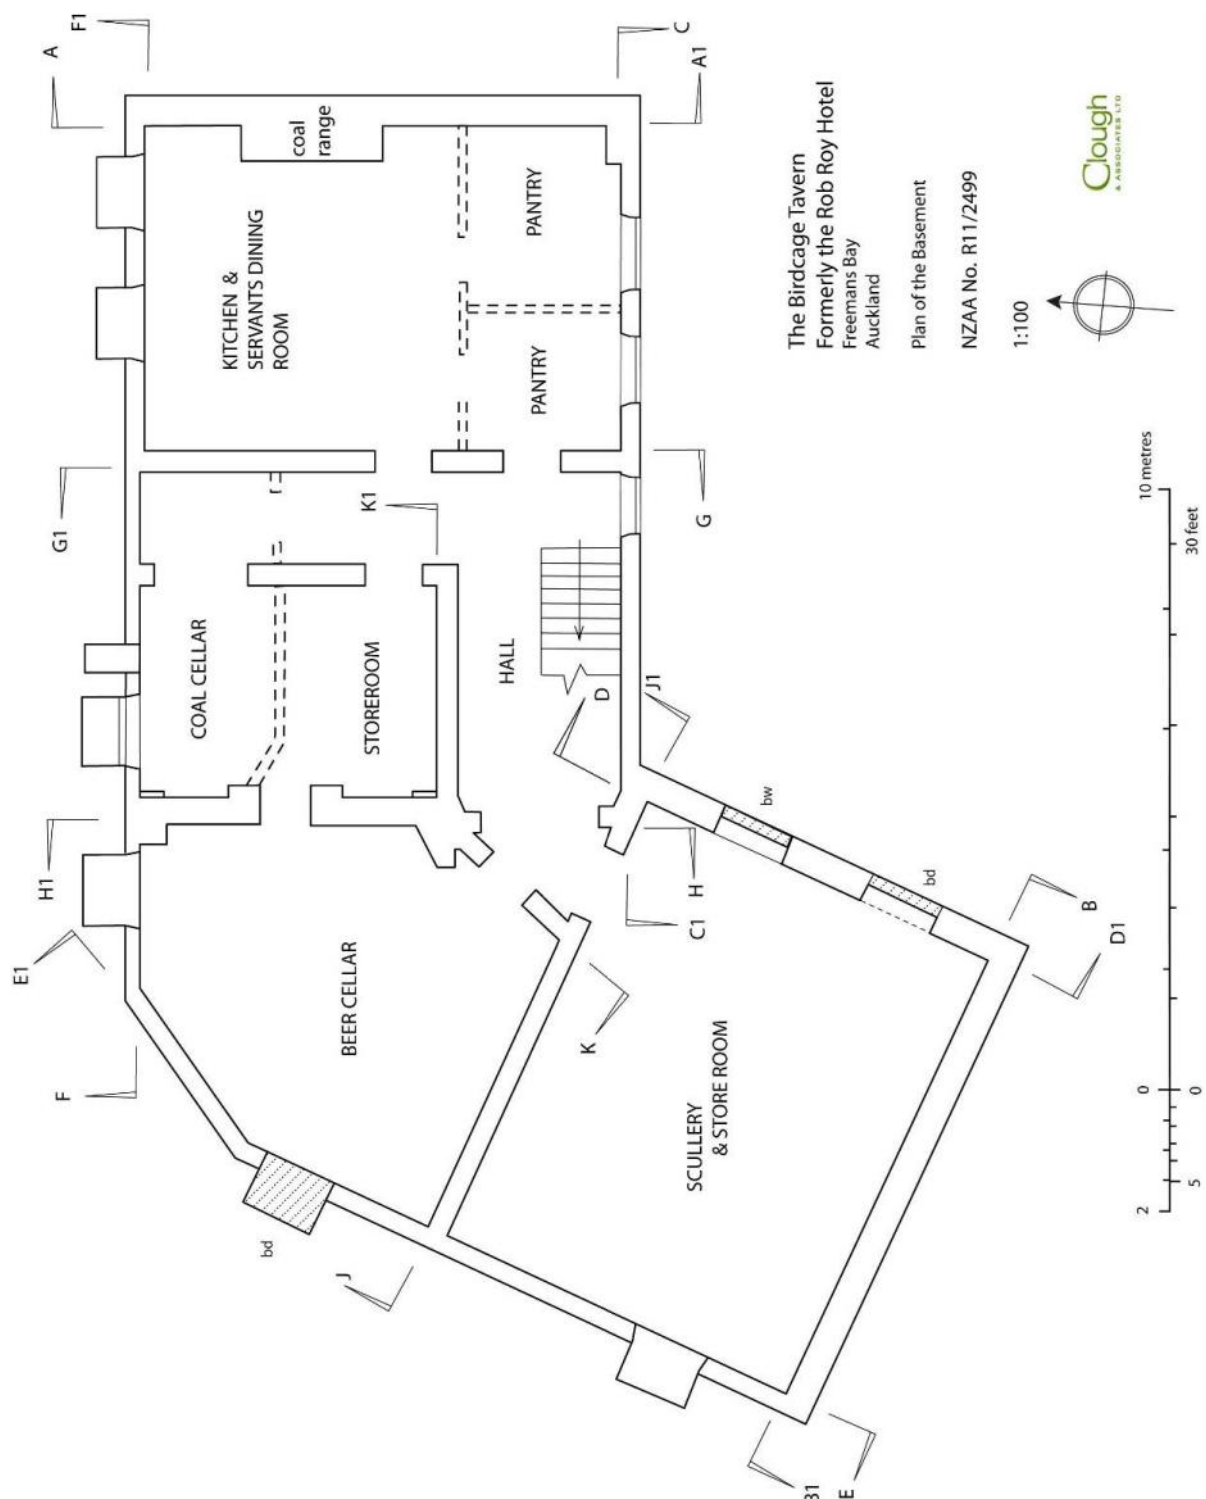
Plan of the Rob Roy Hotel basement. The original base map was provided by Salmond Reed Architects, and has been adapted following on-site recording, and use of drawing conventions following English Heritage Guidelines (Appendix 1). (NB. Scale is 1:100 at A4 scaled only)
